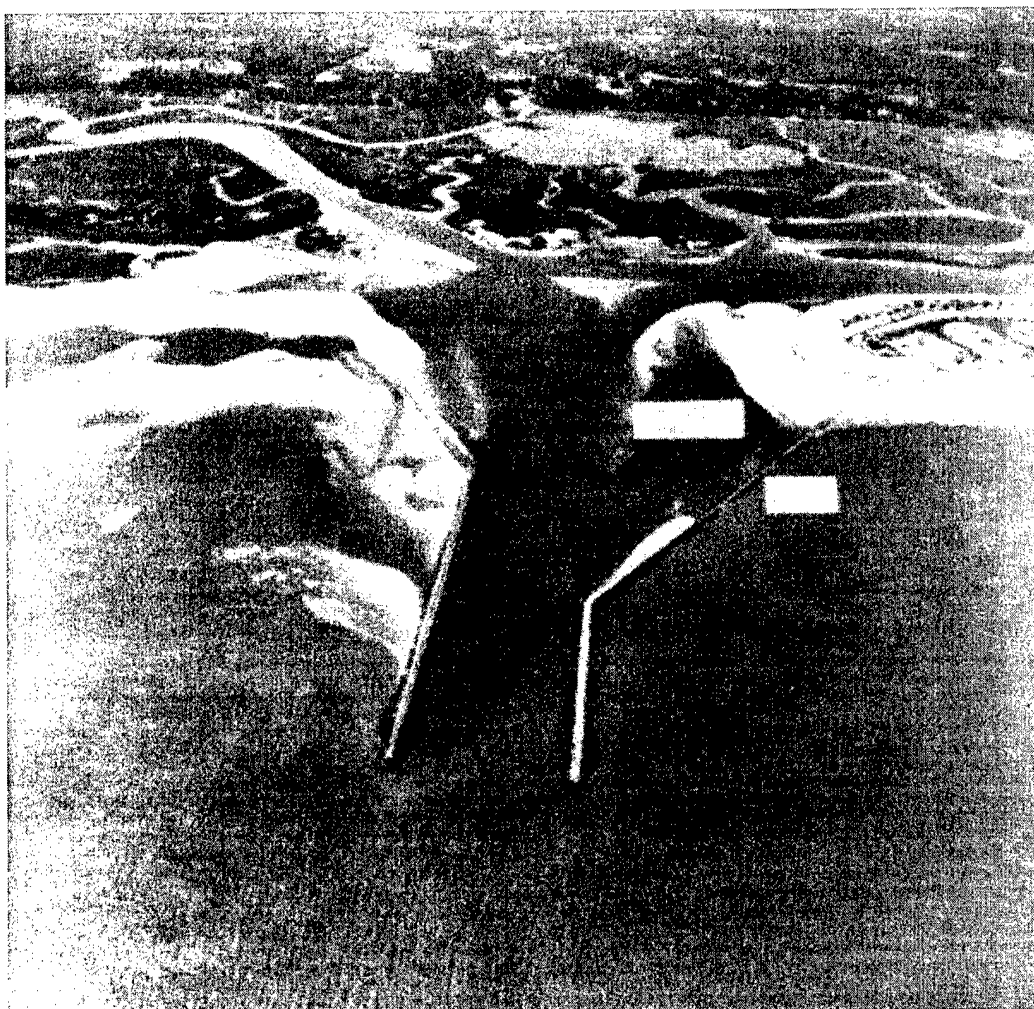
View of Murrells Inlet project, as constructed in 1981.
